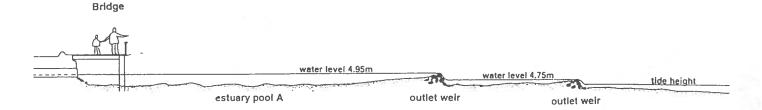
Plan of the proposed Spanish Banks Creek estuary.
